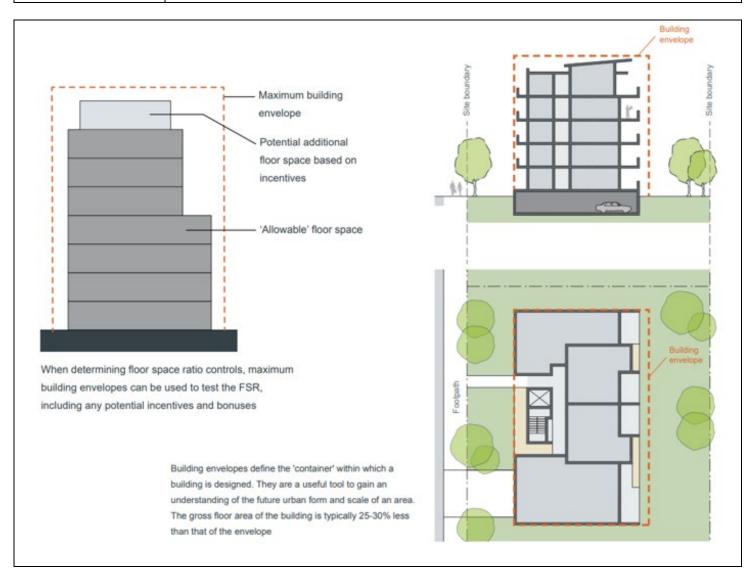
Guide to Setting Building Envelopes (Source: Apartment Design Guide)
